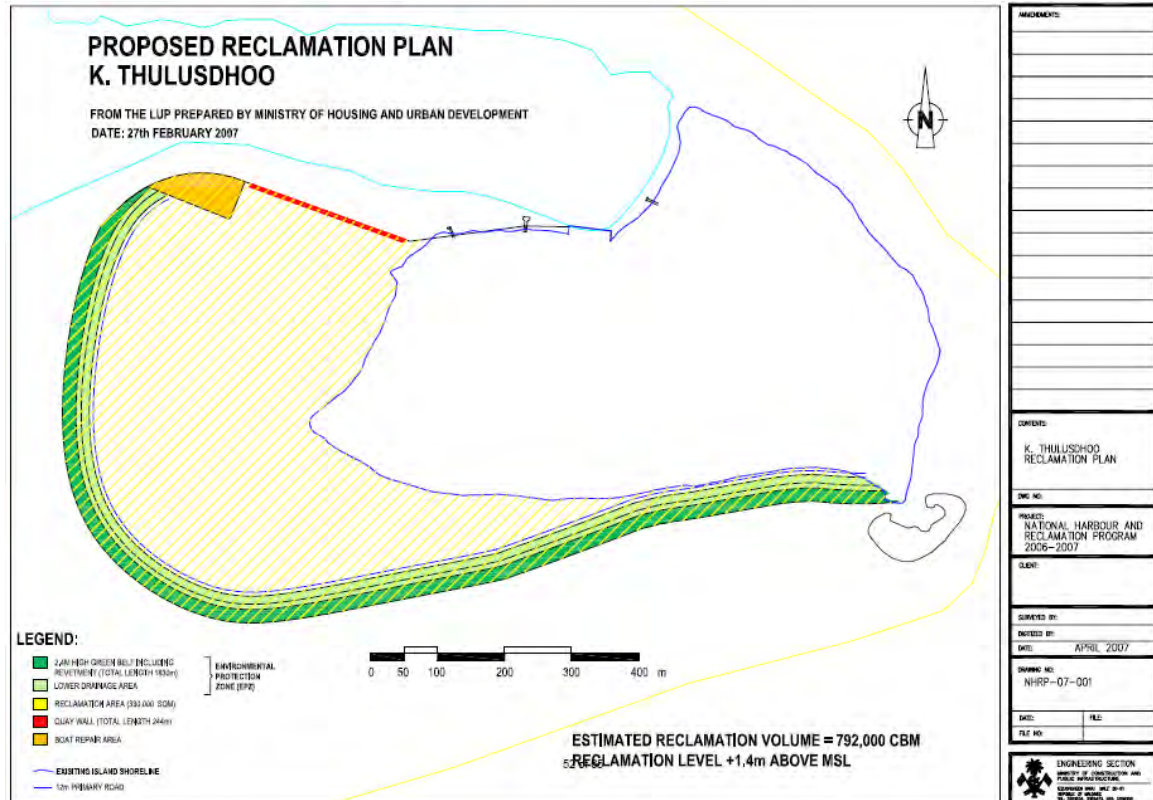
Preliminary design of reclamation areas, revetments, breakwaters and quay wall at Thulusdhoo
